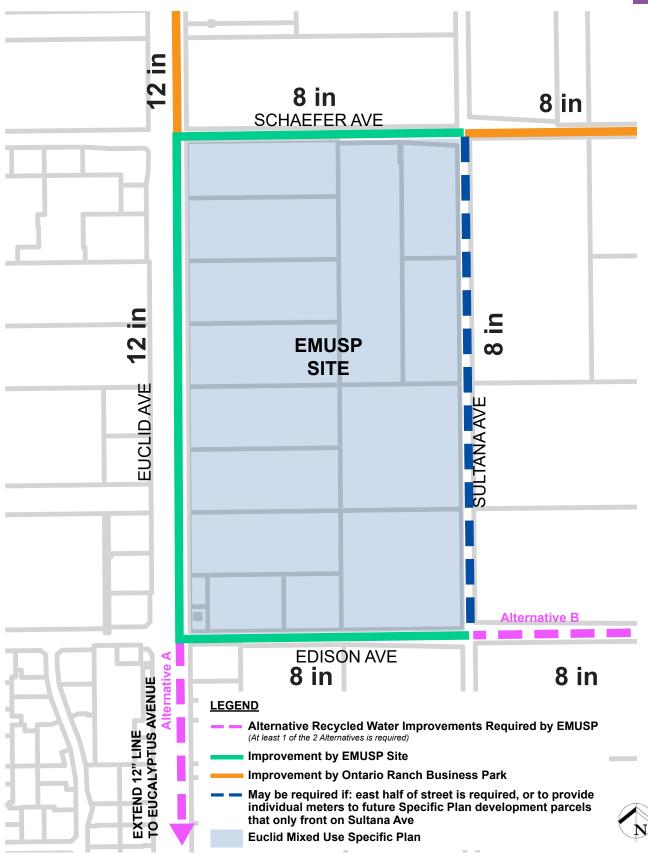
SPECIFIC PLAN RECYCLED WATER PLAN
